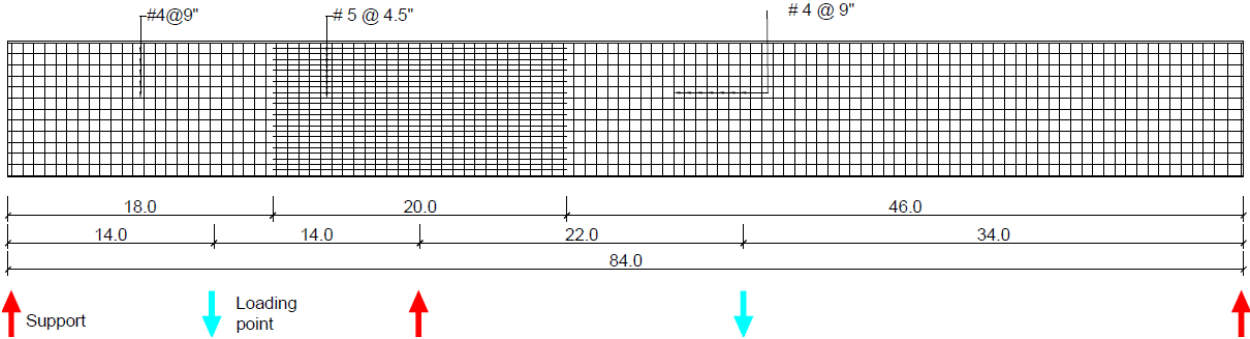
Steel Reinforcement Rebar Layout – Tub #1
